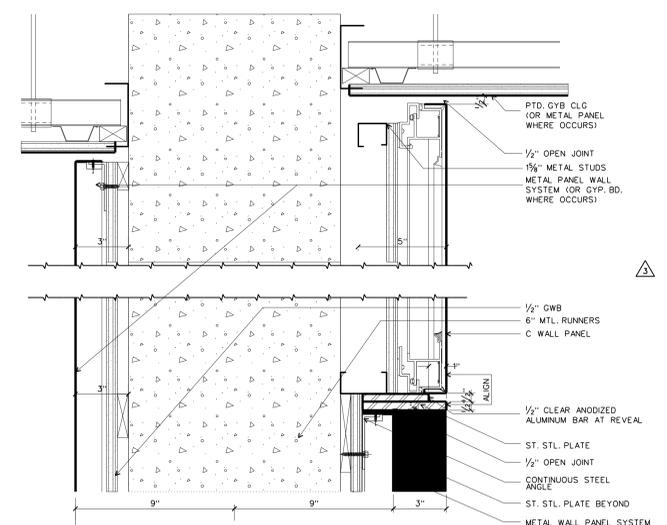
DETAIL AT GRILL / ALUM PANEL SYSTEM
